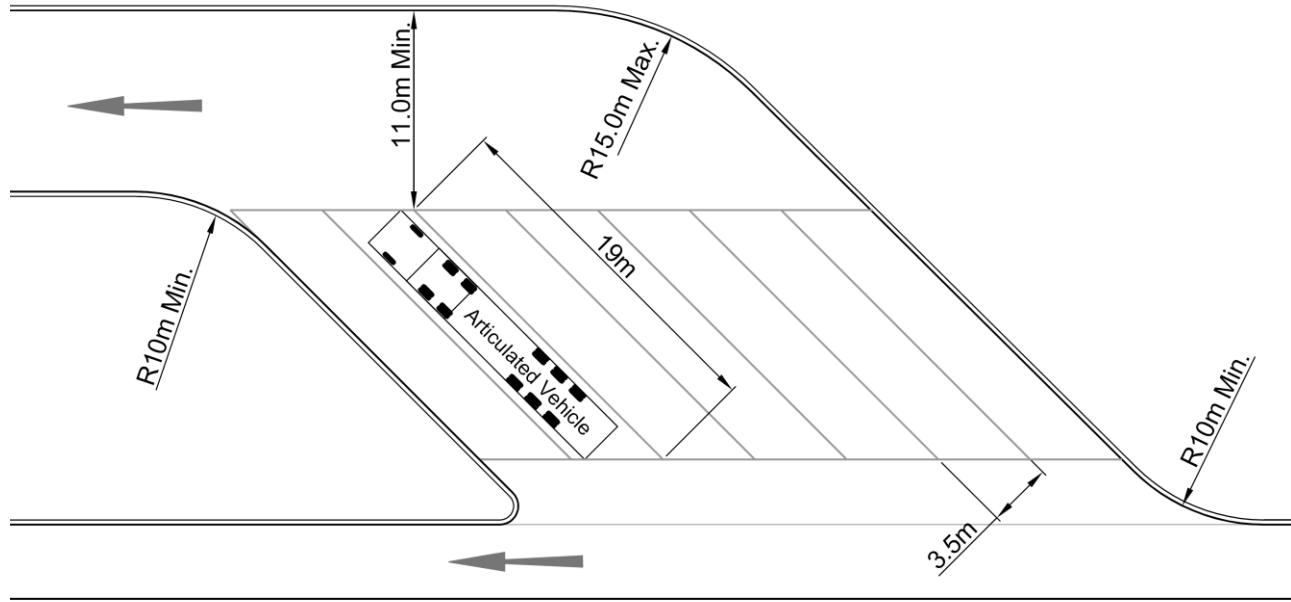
One-way HCV Parking System with Parking Bays at 45 Degrees
